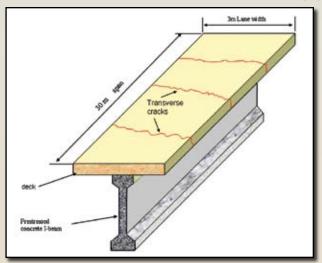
Bridge deck structure modeled for cracking due to shrinkage effects
